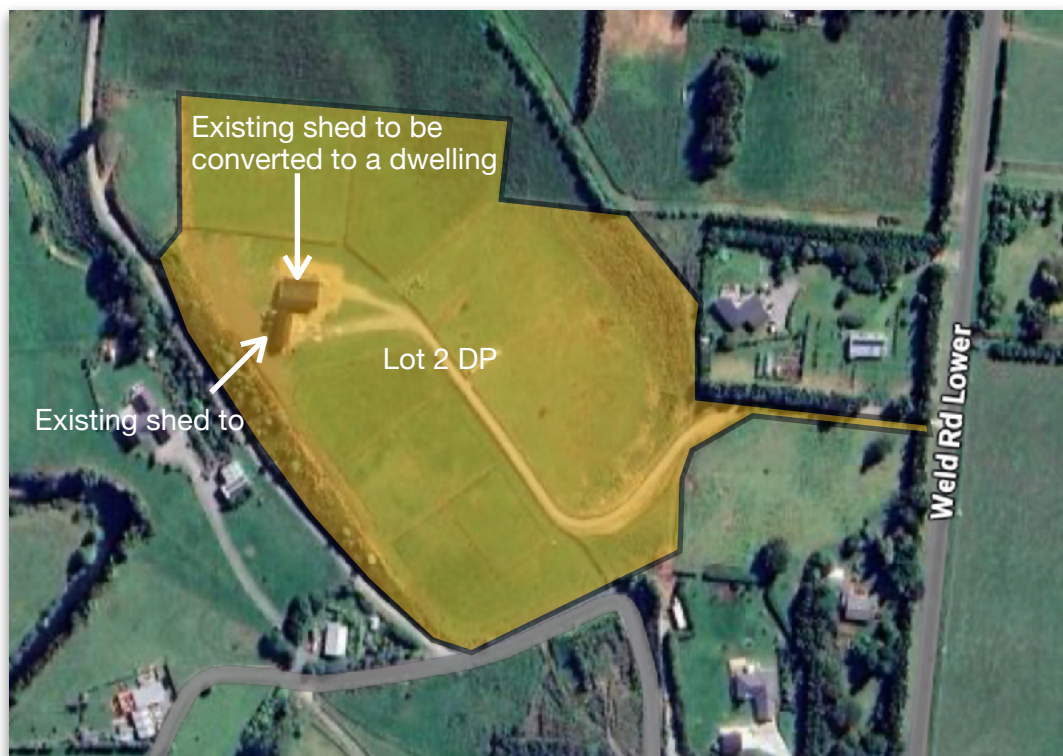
Site Plan showing existing shed to be converted to a dwelling.
